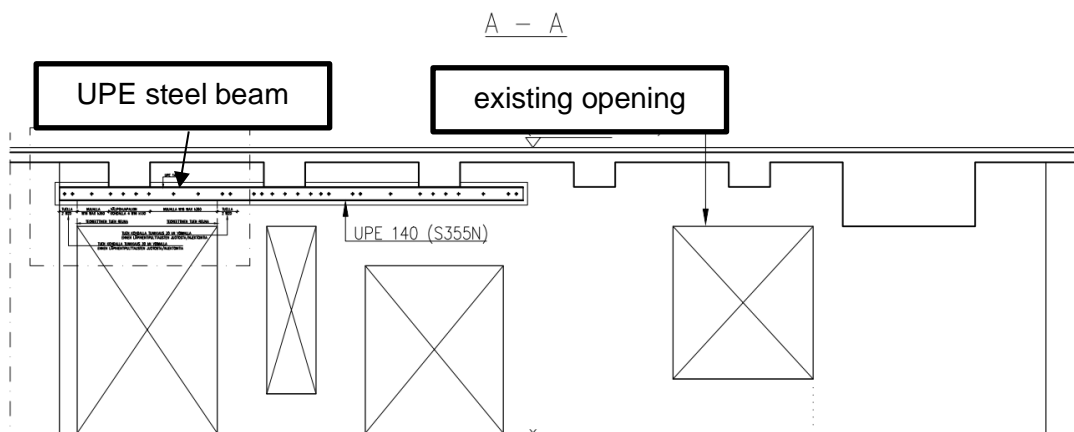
Example of strengthening of an opening in a bearing wall with steel beam.
